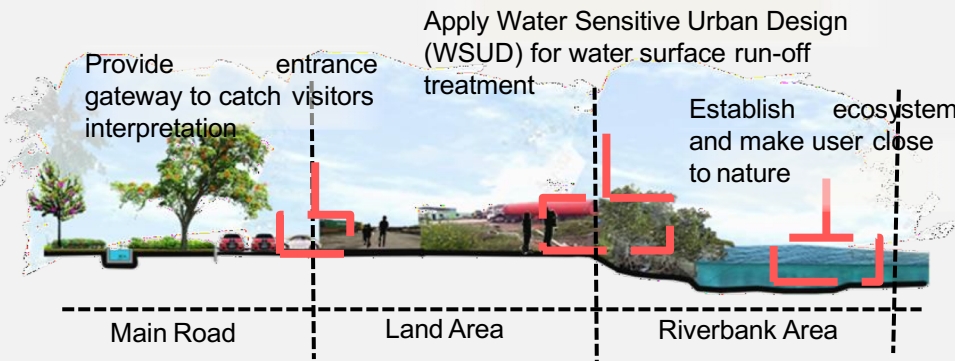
Cross Section-Elevation towards the pleasant attraction of places.
